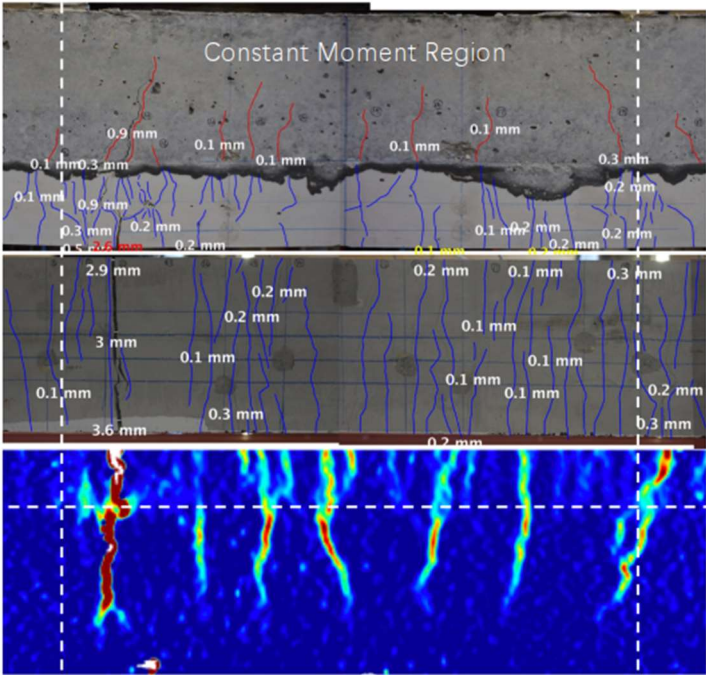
crack pattern of a hybrid reinforced concrete beam (Huang, 2017)
